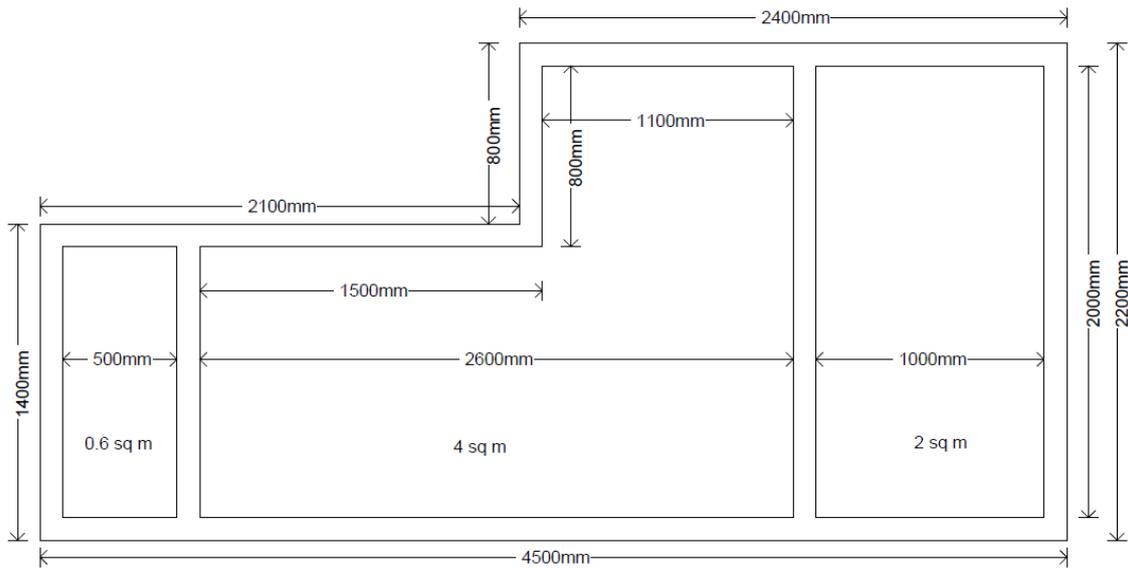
Our Construction Plan for The New Grease Trap Section (top view)⁴
